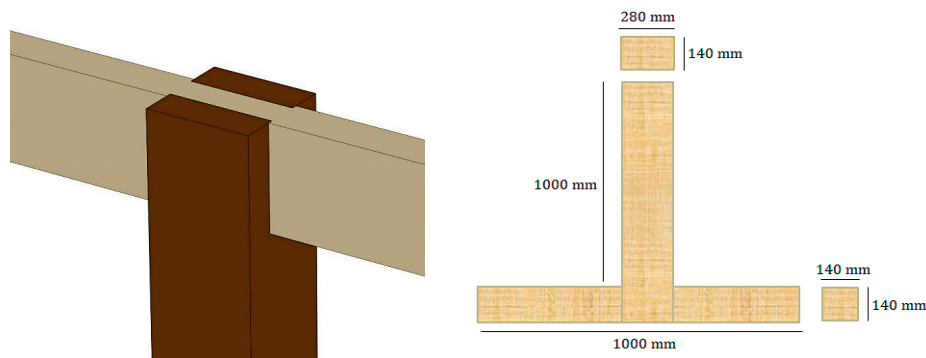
Wooden notched column-beam connection, A: Wooden notched connection example, B: Figural representation of dimensions of column-beam connection
